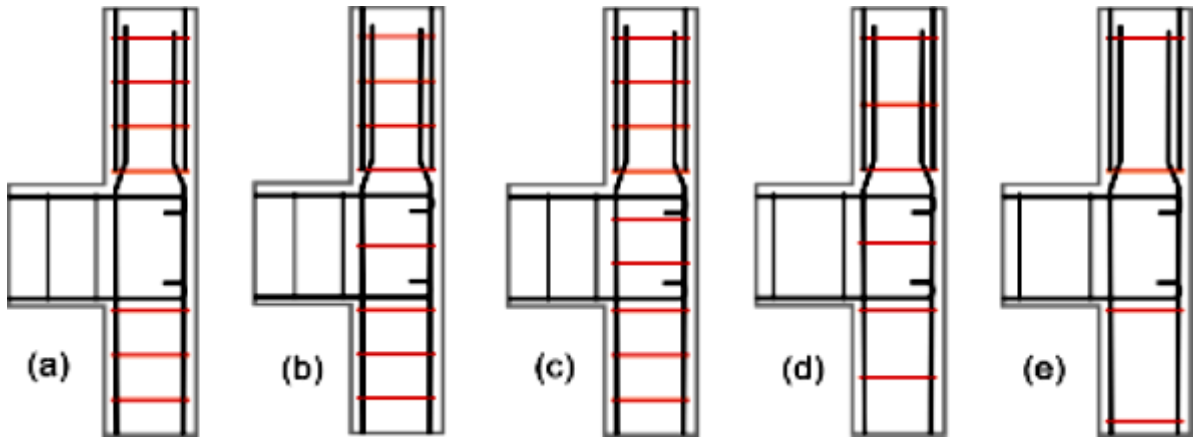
Schematic view of joints reinforcement in pre-1970s buildings (NZSEE2017)
